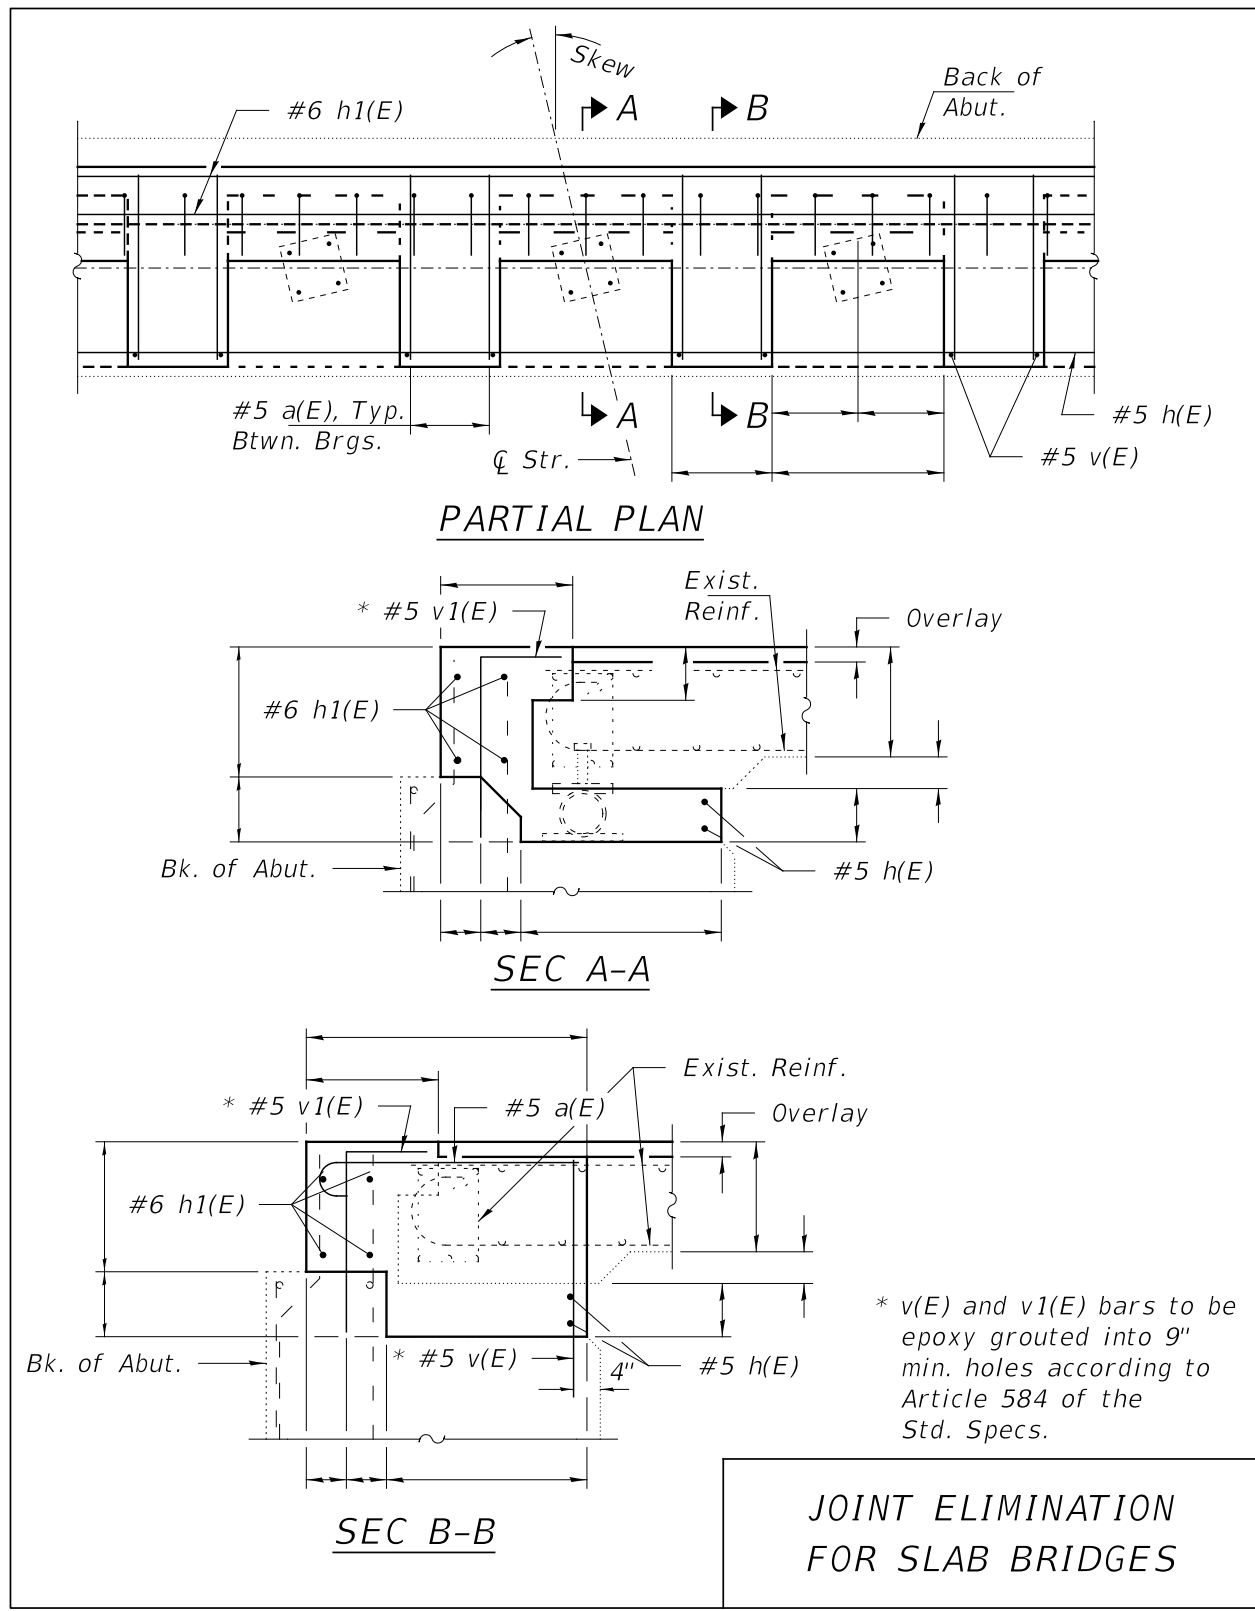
Joint Elimination for Slab Bridges
